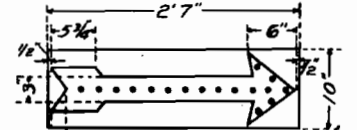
DETAILS OF ROAD UNDER CONSTRUCTION SIGN
